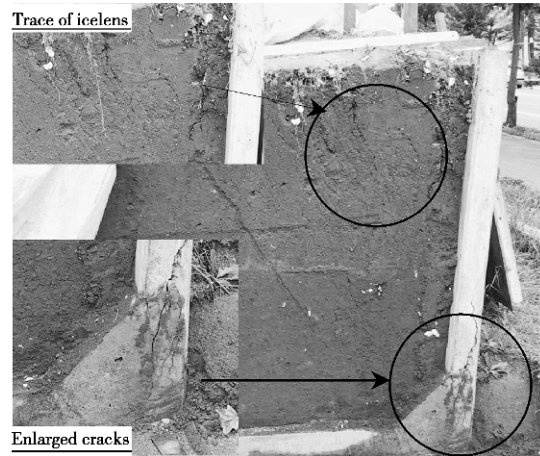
Typical crack occurred at the foot of concrete L-type retaining walls
